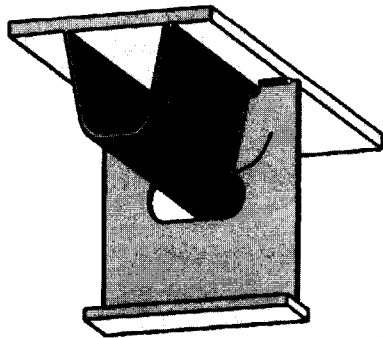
Weld crack of longitudinal rib and transverse rib
